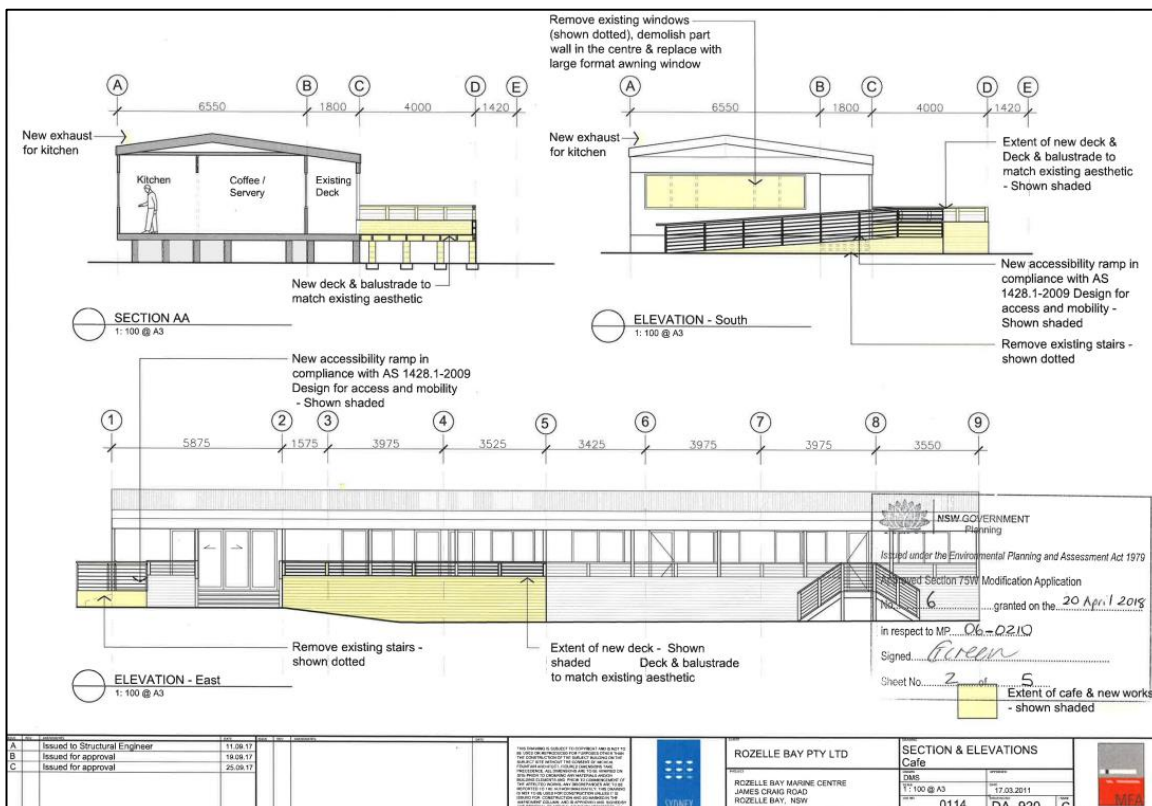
| Detailing the updated elevations of the building from MOD 8 (Source: Modification Application)
